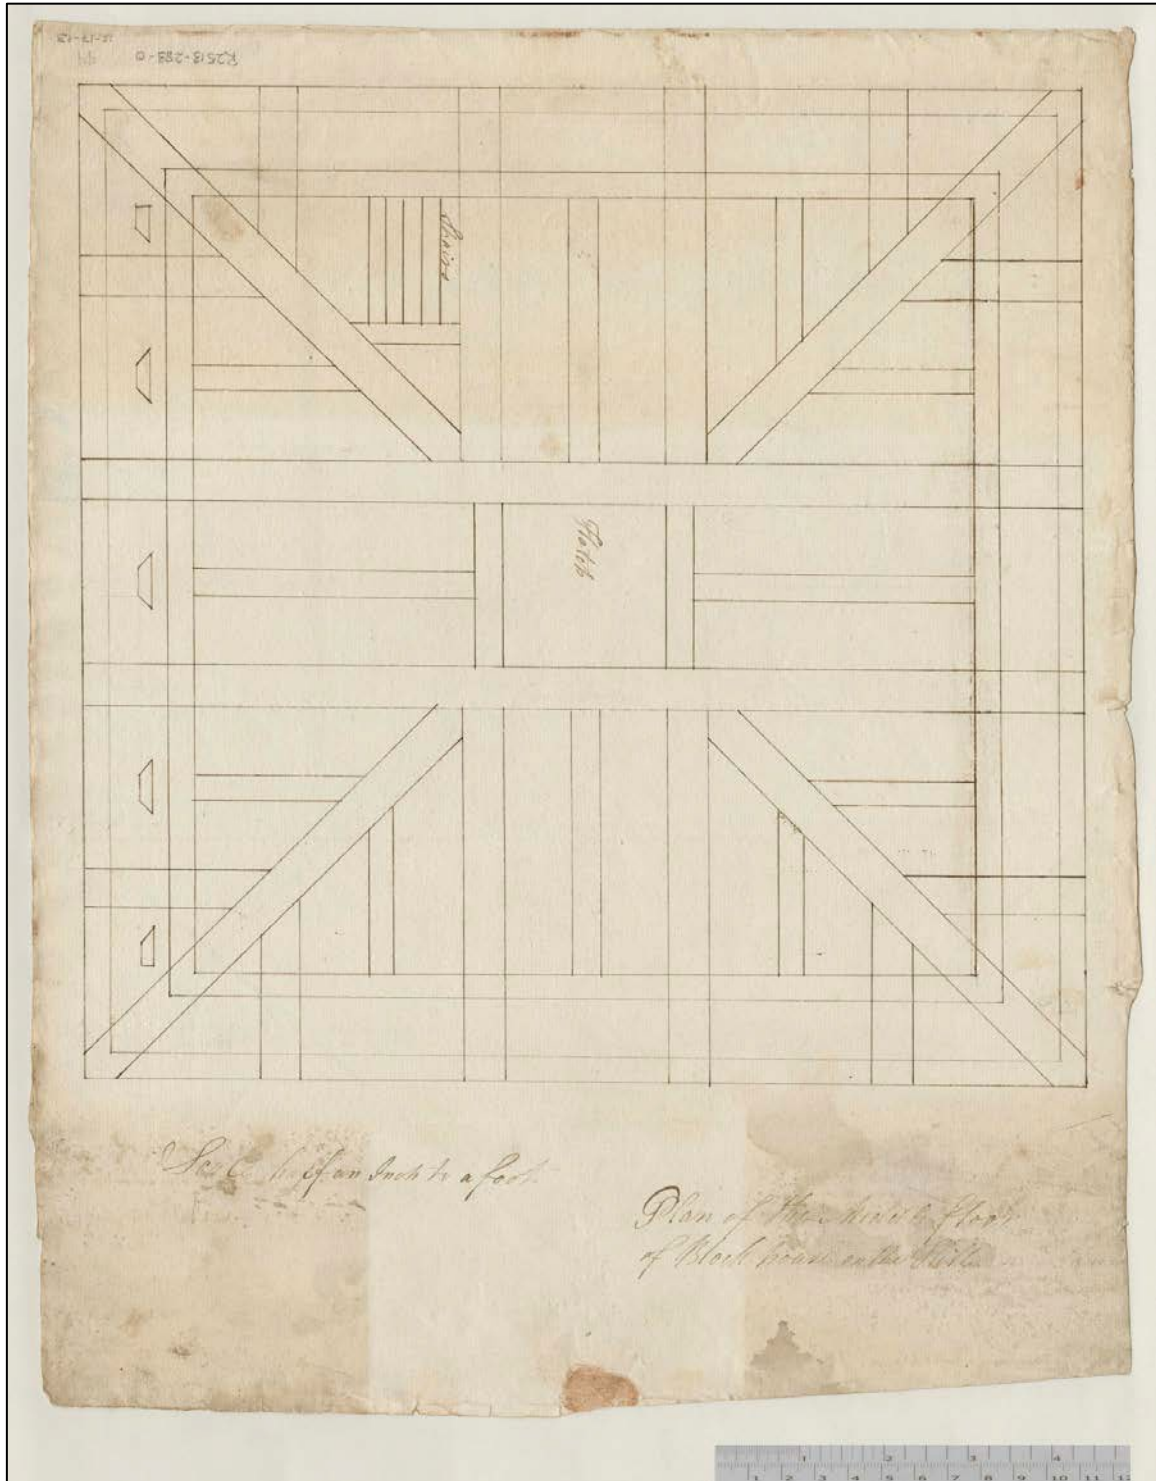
1812 architectural "Plan of the Middle floor of Blockhouse on the Hill".¹²⁸ Note stairs at the top and a hatch at the center.
